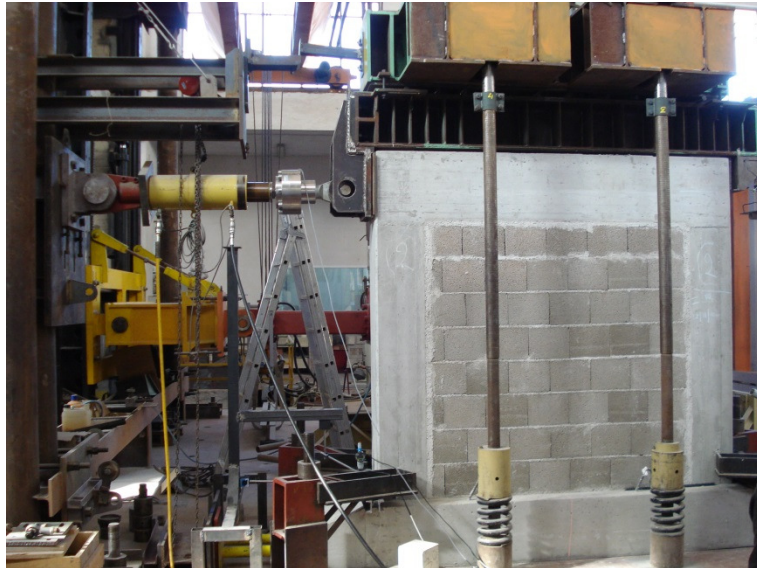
Lightweight concrete masonry infilled frame specimen in the test apparatus.
